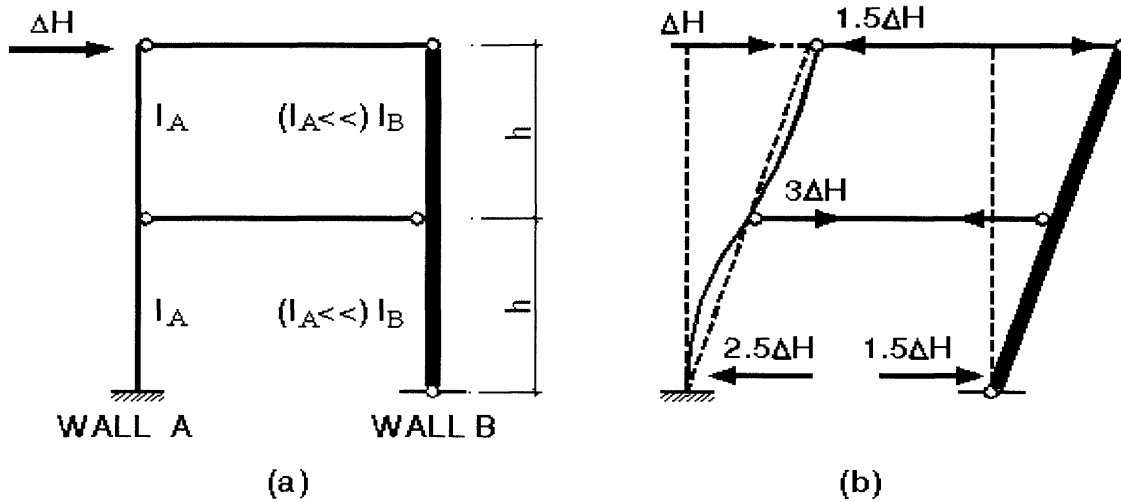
Two-storey wall system: (a) Properties and loading. (b) Floor forces, base shears and deflected shapes.
